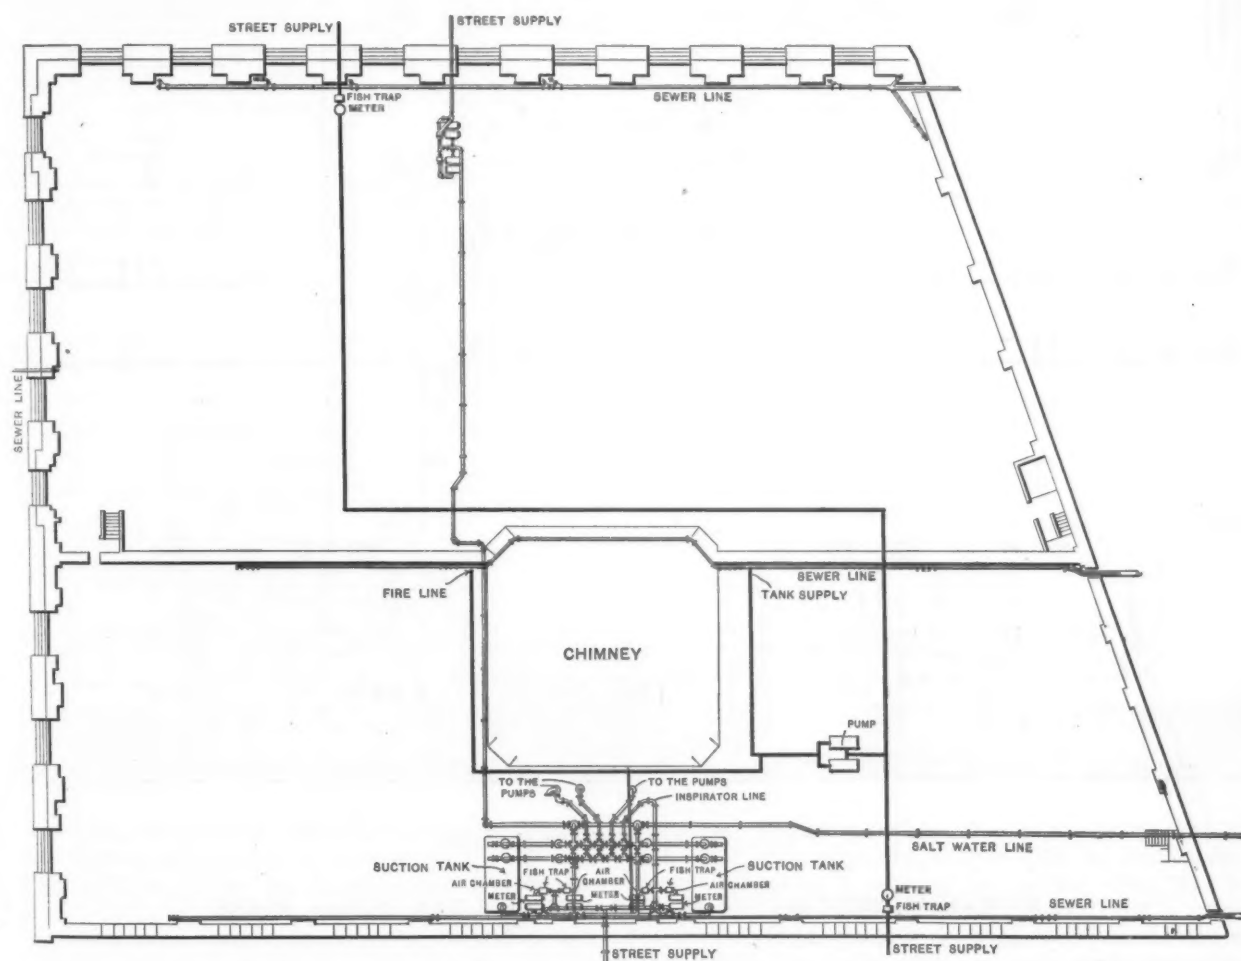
Plan of Basement, Showing Water Supply and Sewer Piping.
